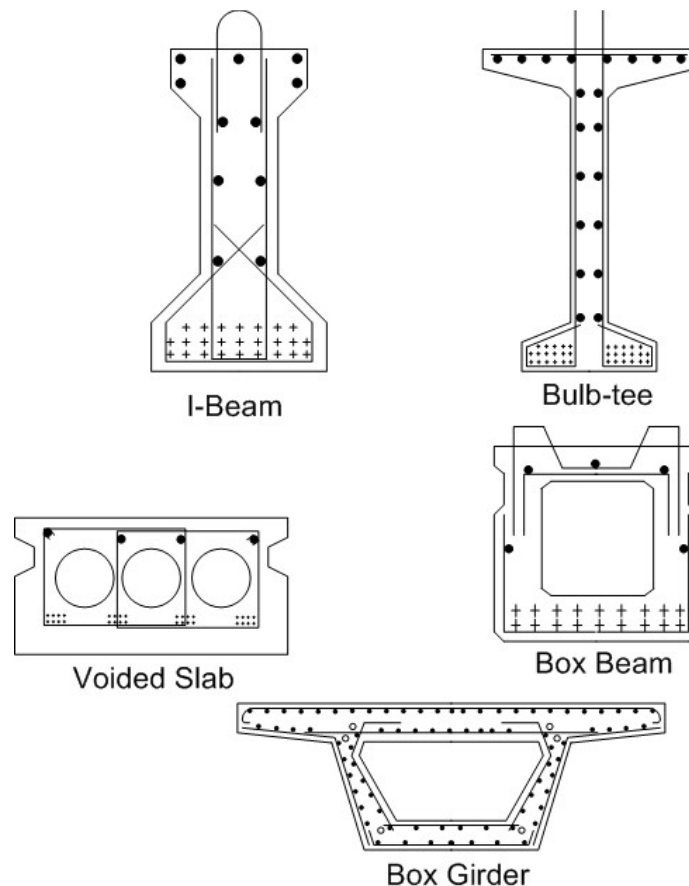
Prestressed Concrete Shapes with Typical Reinforcing Layouts
